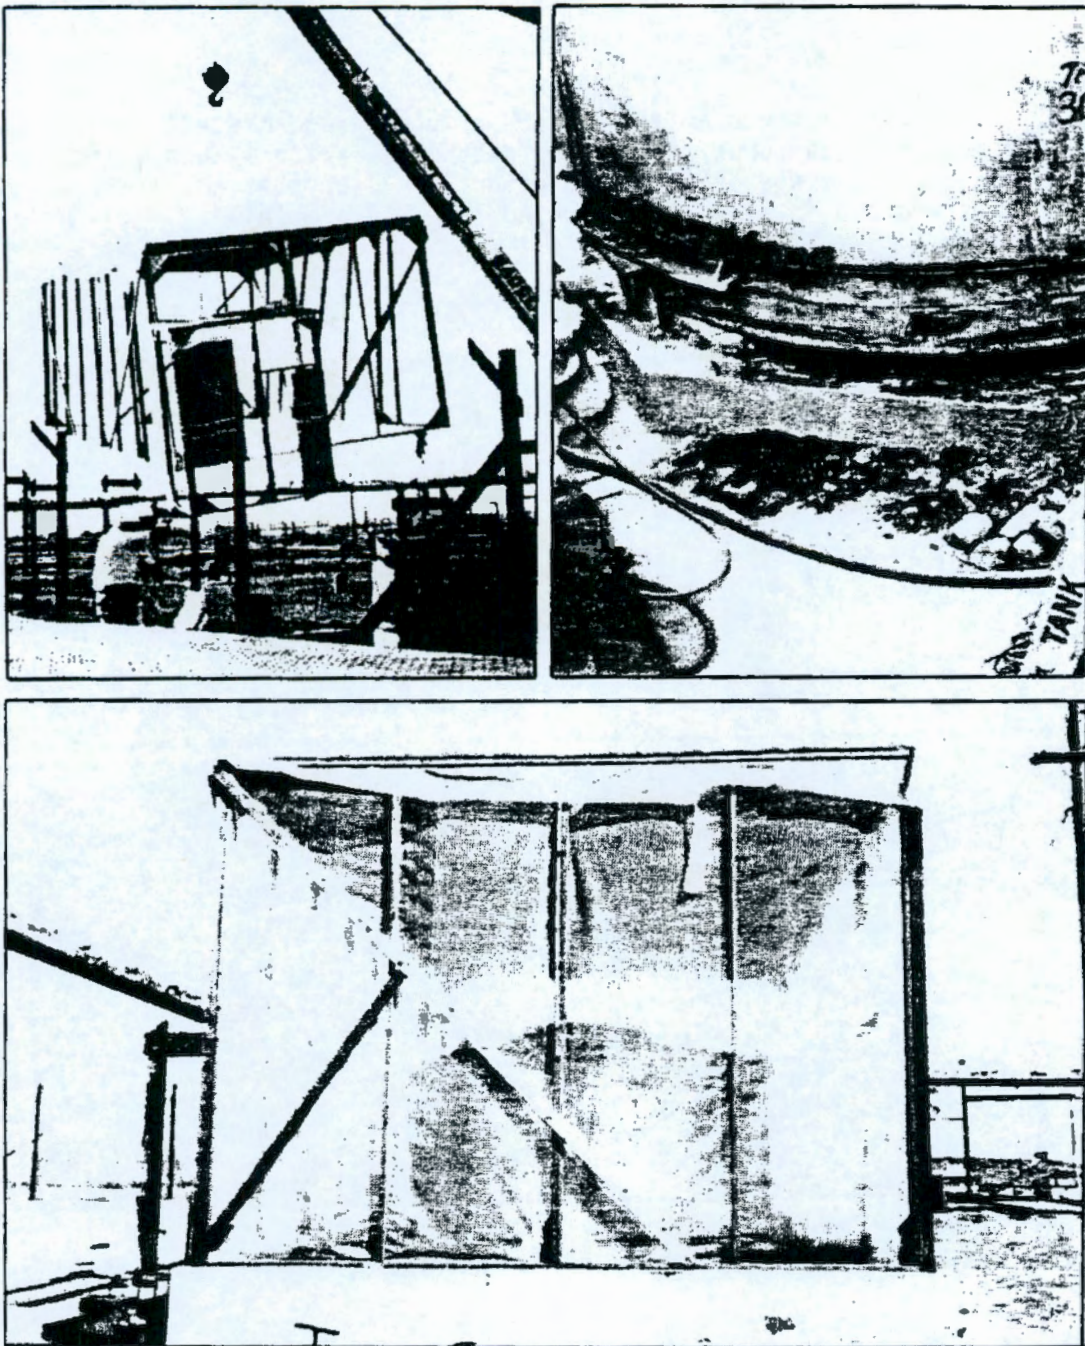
Lagging and Concrete Removal at 203-S. Hoisting the prefabricated greenhouse into position (top left); the completed greenhouse in place for controlled stripping of uranium-soaked lagging and concrete (bottom); the tank bottom after using the jackhammer on the grout seal from the lower 12 in. of the tank side (top right).
